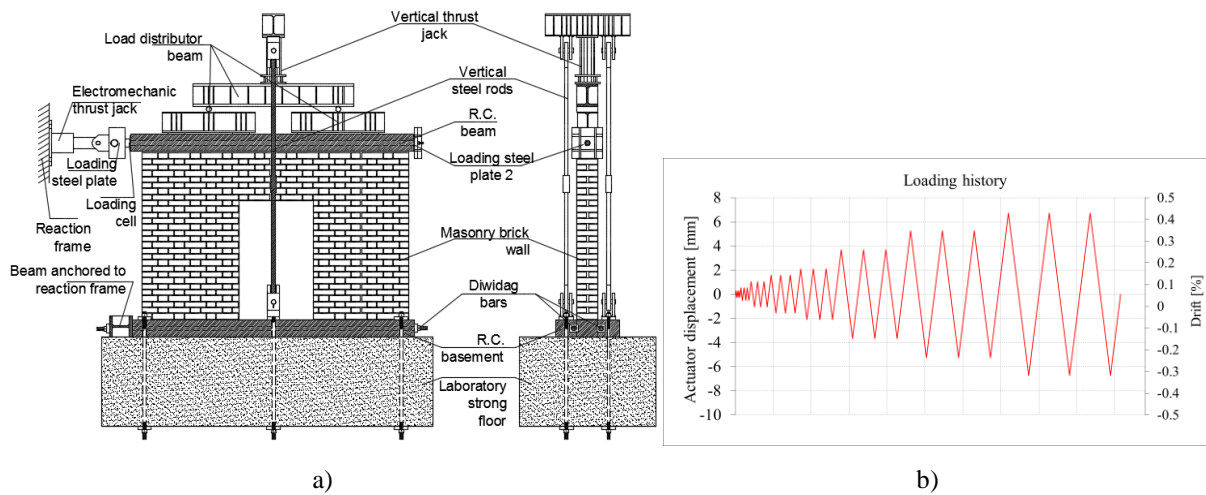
a) Elevation of experimental testing setup b) Loading history.
